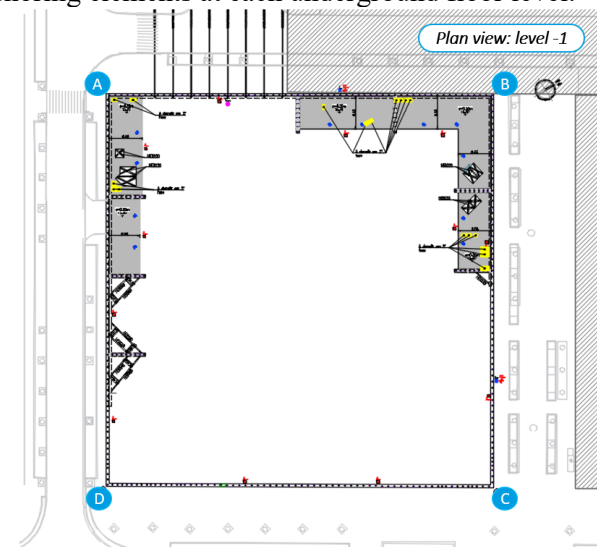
Design plan view of the peripheral earth retaining solution at level -1.
